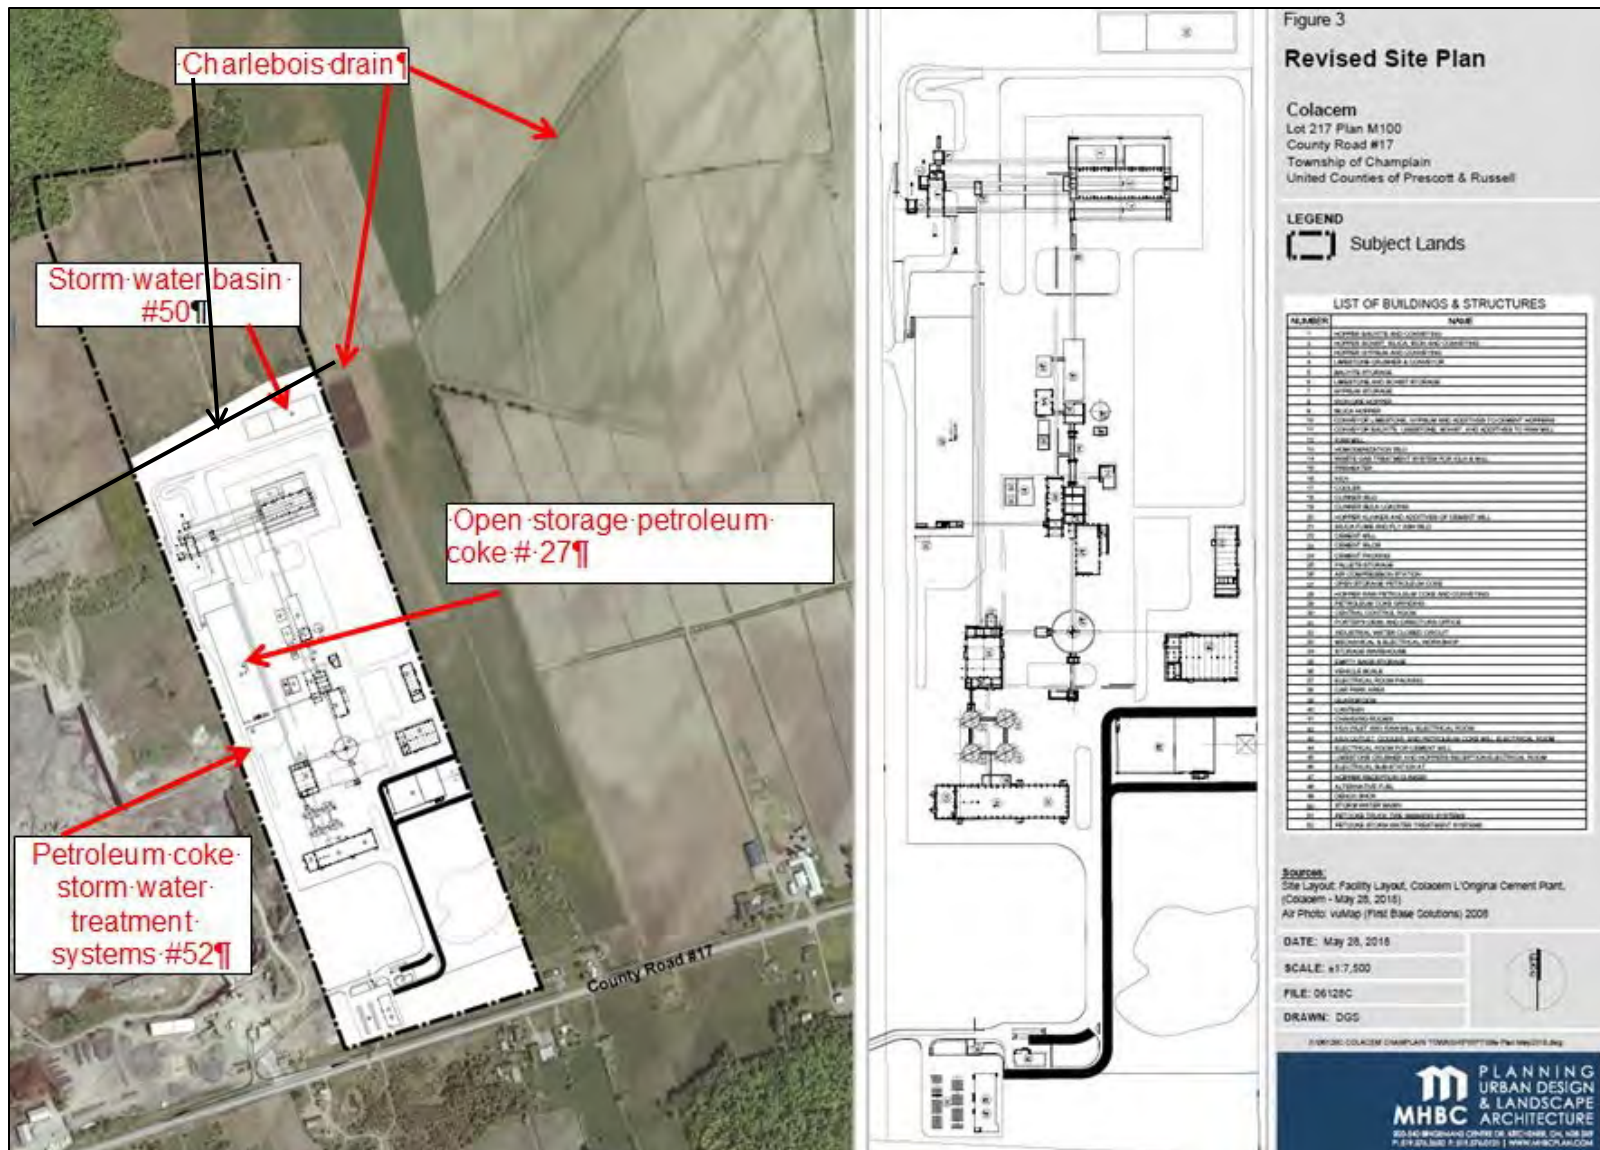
Colacem’s proposed cement plant Revised Site Plan. Screen capture of page 80.⁴¹ The drain Charlebois has been added in blue where the site overlaps its course. The text boxes and the red arrows refer to the structures of concern.
